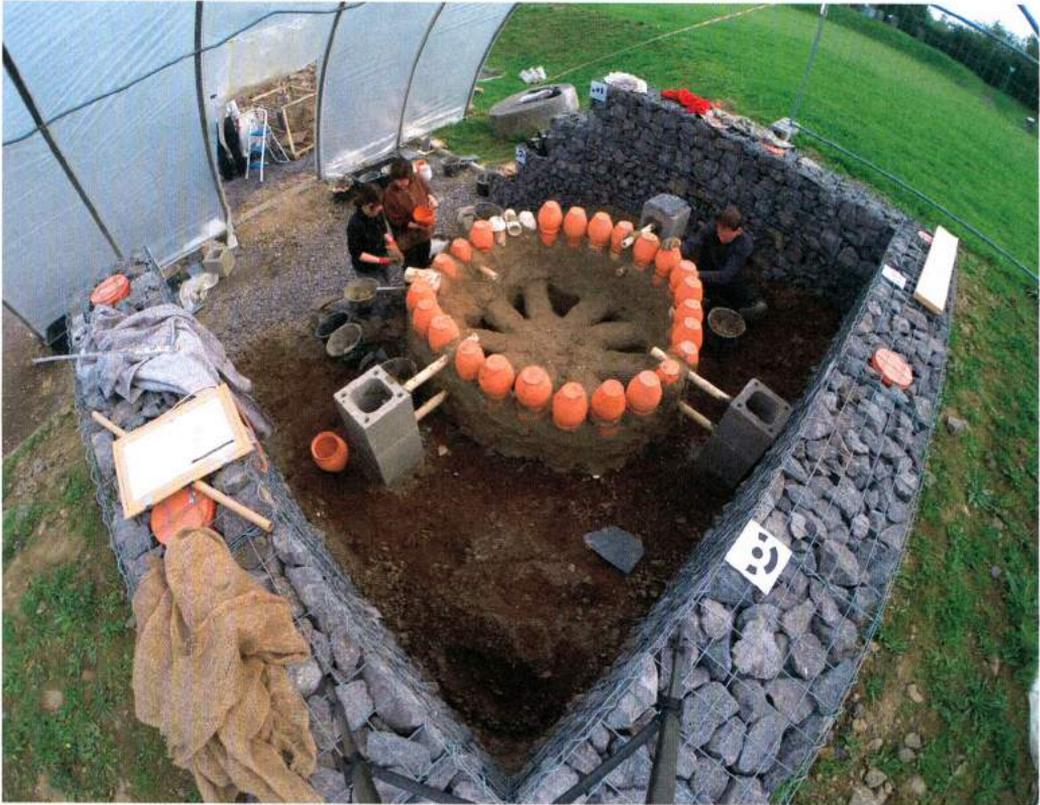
Construction of the firing chamber using upside down pots. – Bau des Brennraumes mit Wölbtopfen.
